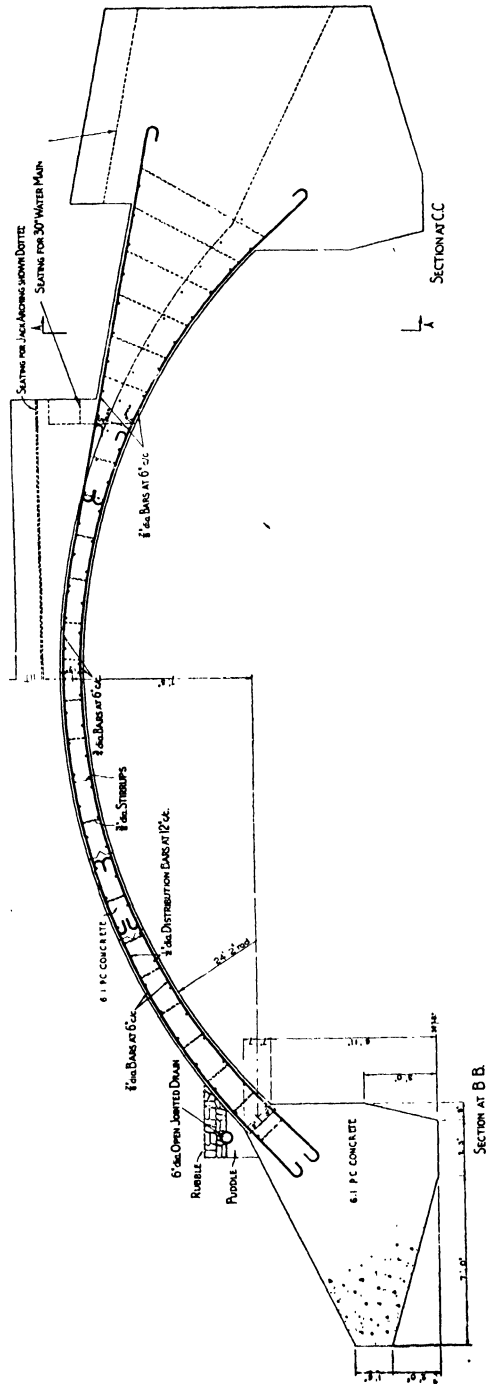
PROPOSED BRIDGE OVER THE RIVER COLE.
